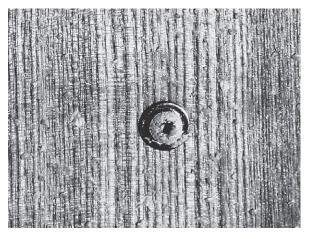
Specimen after eight weeks of salt spray test: corrosion appearances on stainless steel screws and salt crystals on the specimen.
